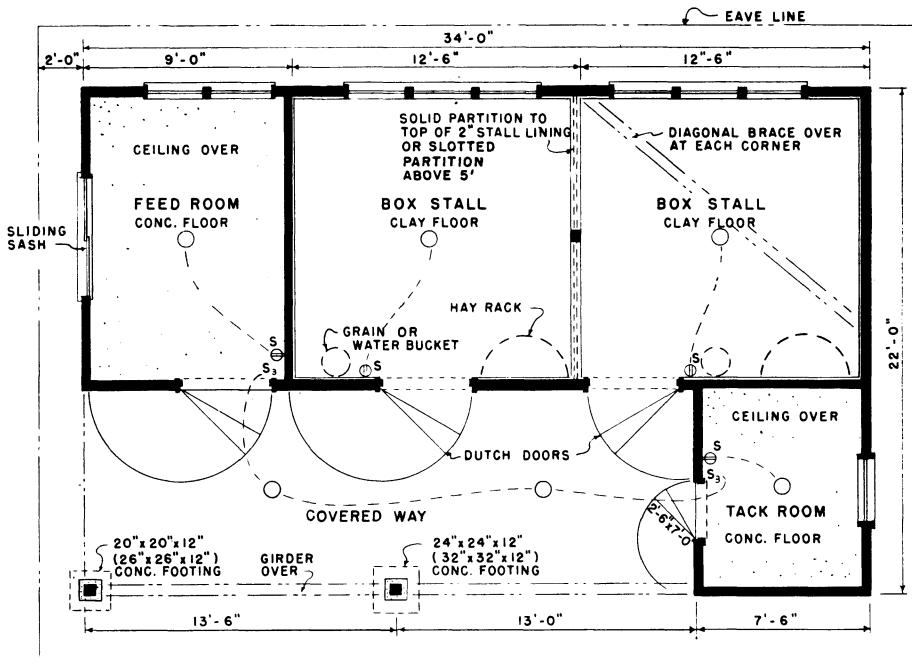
Plan for riding horse barn in figure 36 (USDA plan No. 5838).
